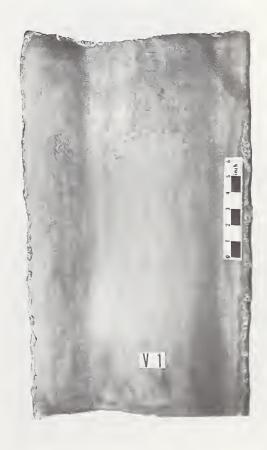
Steel sheet pile section cut from a floodwell et North Little Rock, Ark., after exposure for 24 years. The section was exposed between 3 to 5 ft below the ground line in fill soil underlain by natural clay soil. The depth of pitting did not exceed 50 mils.
